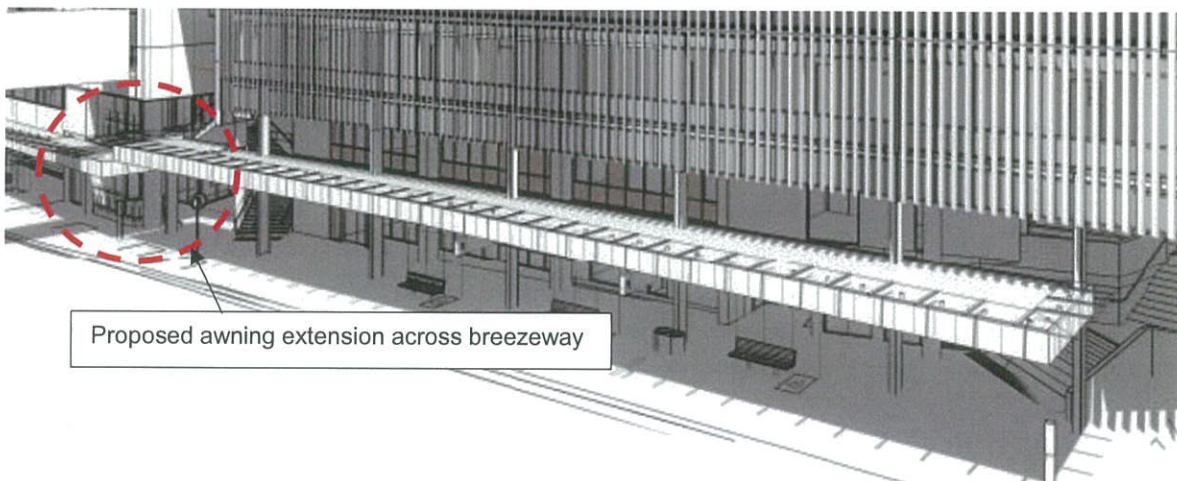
Perspective drawing of proposed awning extension as viewed from Pittwater Road looking north east
